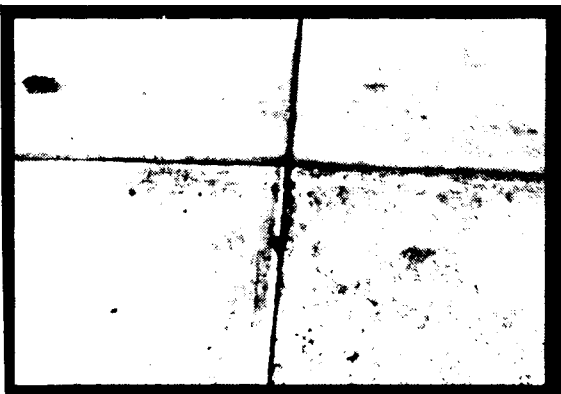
Nonexistent joint sealant typical of many PCC pavements.
